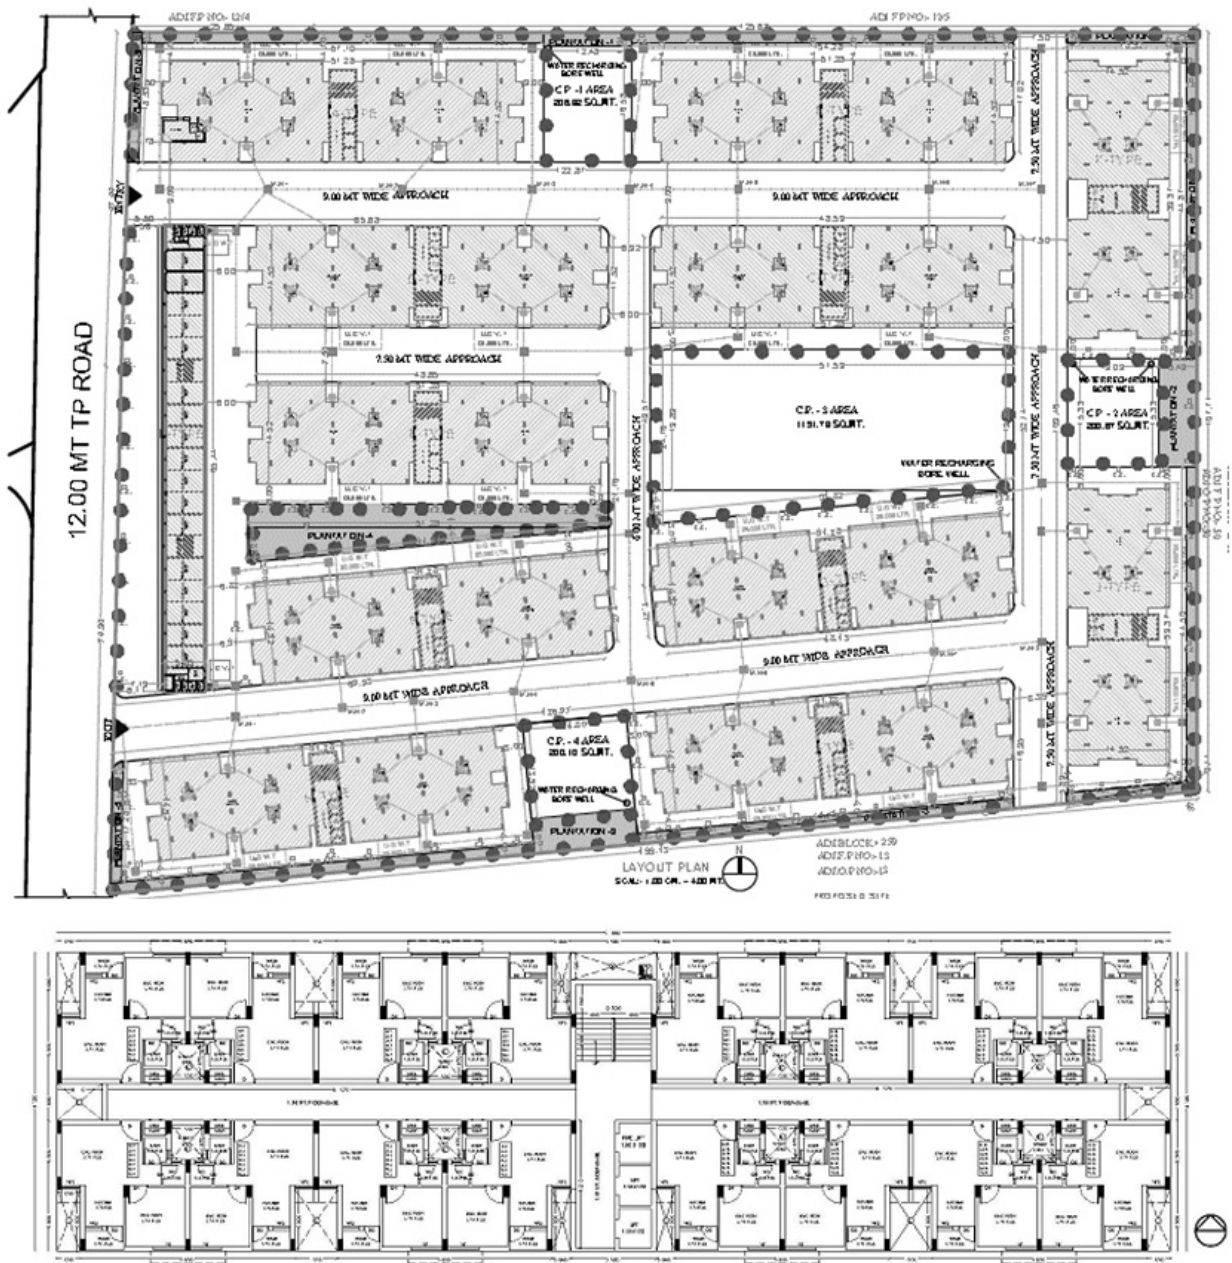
Site plan and typical unit plan of SMARTGHAR-III project, Rajkot
